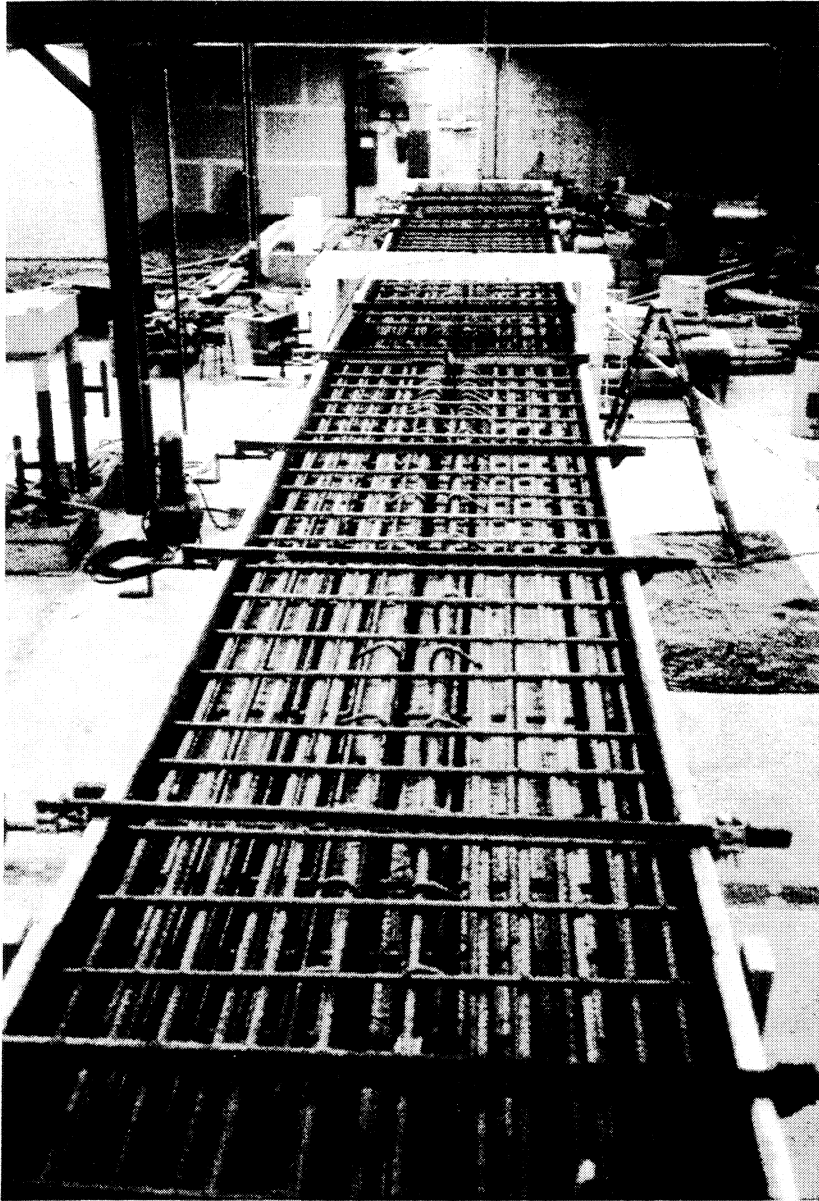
Laboratory Test - Reinforcement in the Slab
